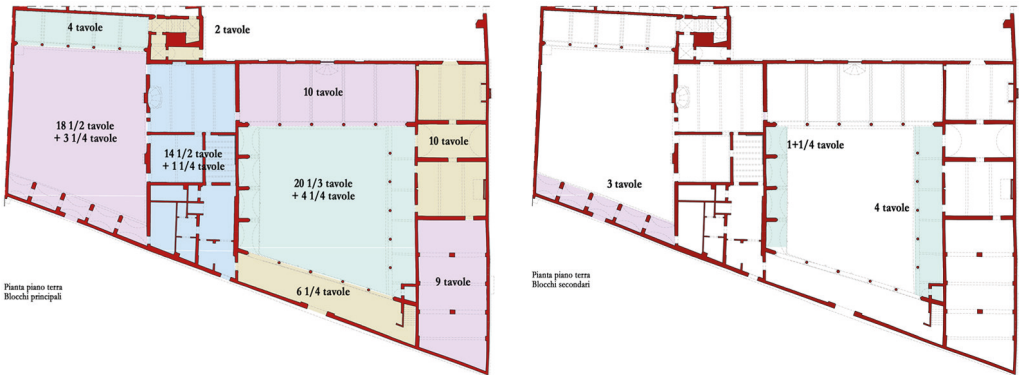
Ground floor plan divided into main and secondary blocks, with the corresponding areas measured in Ferrarese tables (drawing by the author).
